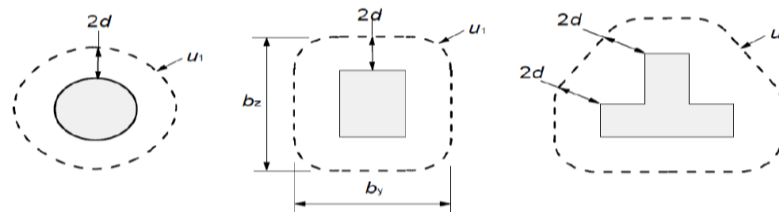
Typical basic control perimeters around loaded areas, (EN 1992-1-1:2004).
